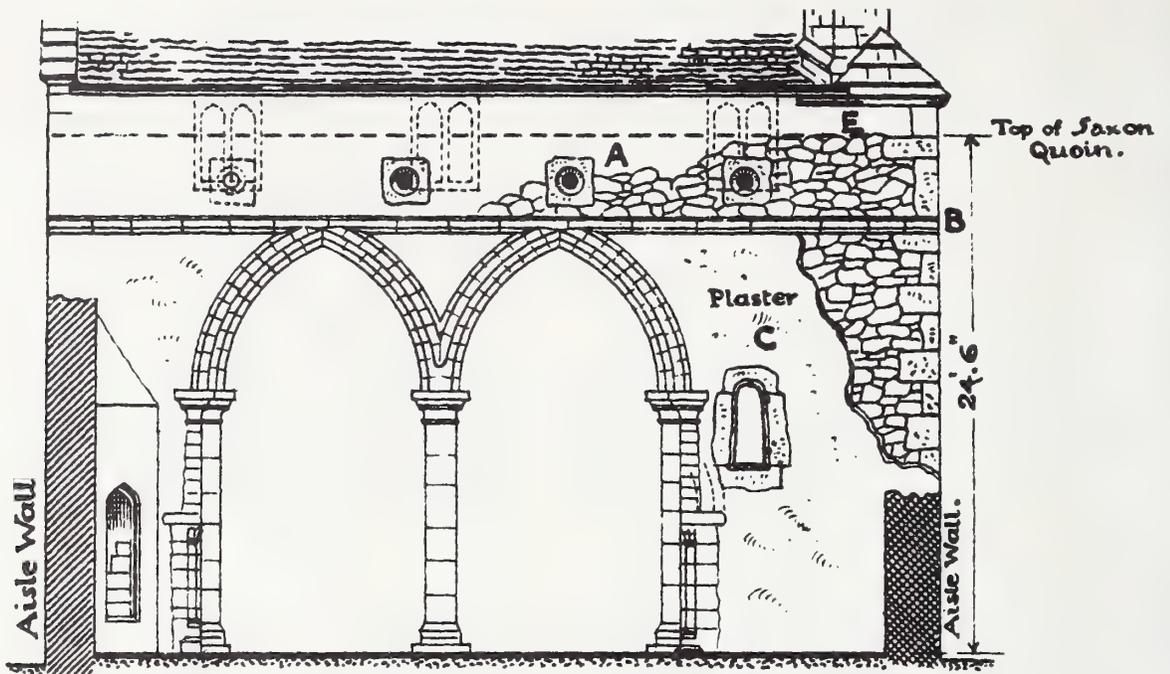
ELEVATION OF NORTH SIDE OF NAVE
